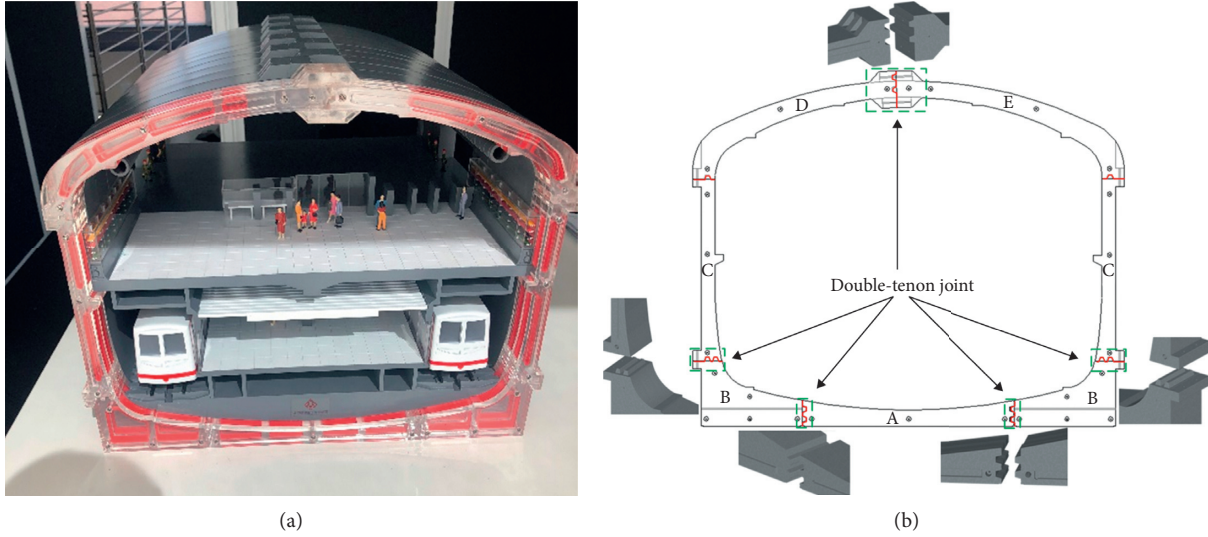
Prefabricated metro station display and arrangement of grouted double-tenon joint.
